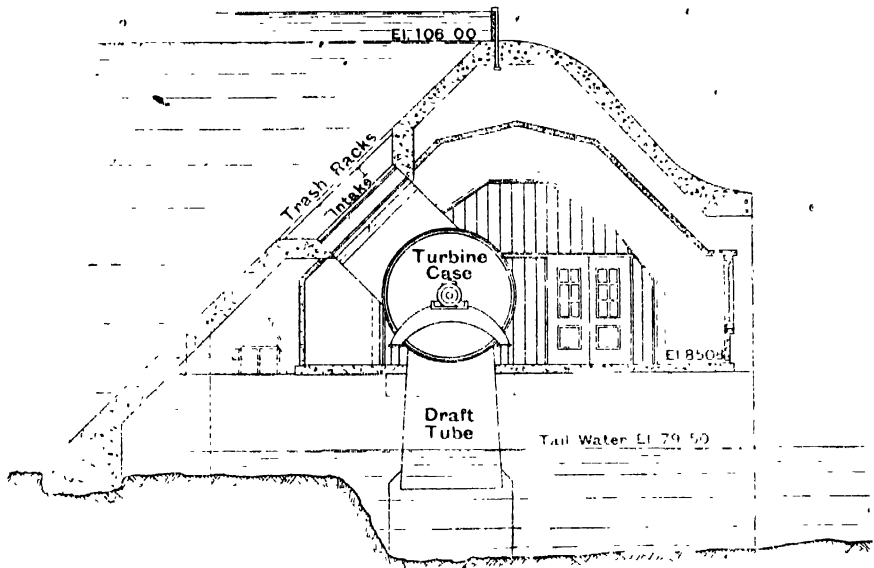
Hollow Ferro-concrete Dam forming Pt.
